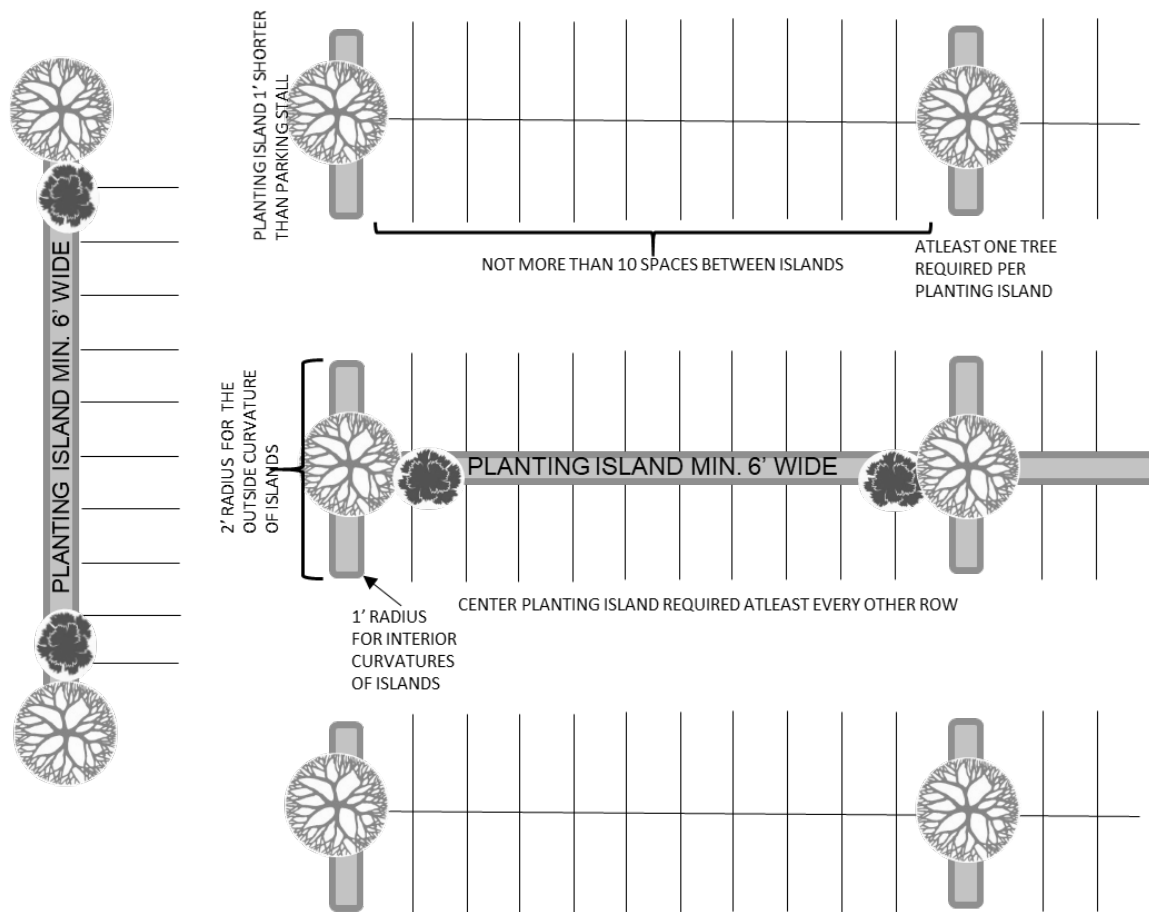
Illustration of Parking Lot Design for 30-49 spaces
